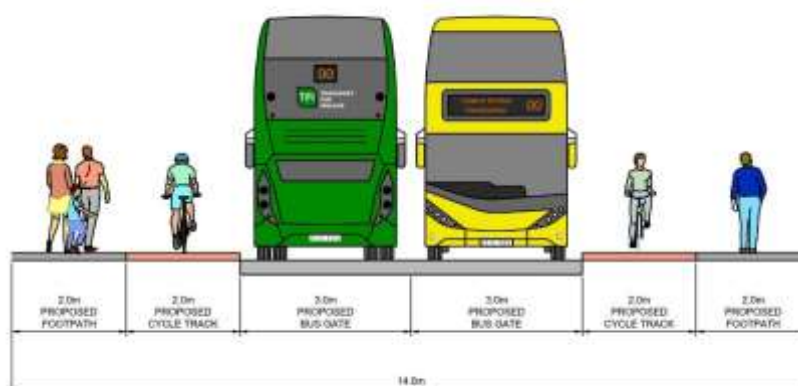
Typical Bus Gate Cross Section (A-A)
